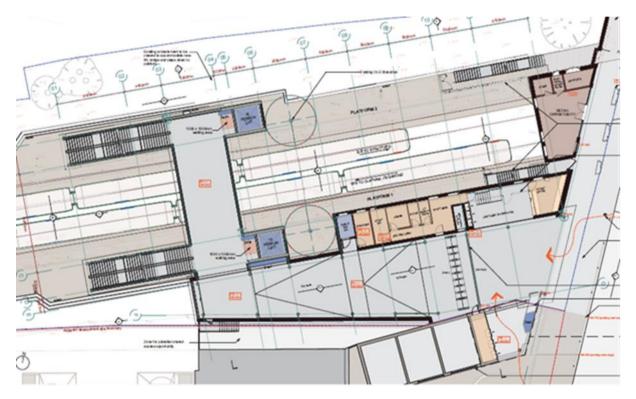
West Hampstead including New Footbridge and Station Structure (Concourse Level)
